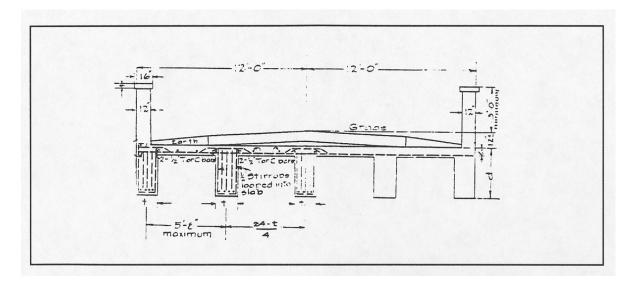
Girder Section from 1912 Standard Plans (Source: Maryland State Roads Commission 1912).
